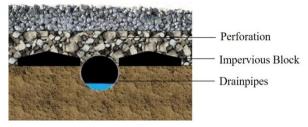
Drainage Design Slika 8 Dizajn drenaže
